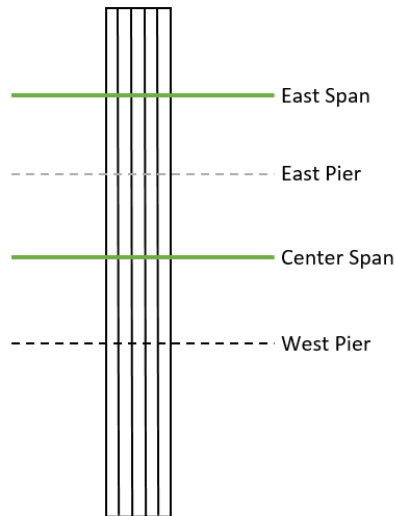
Maple Bridge instrumented braced dry run cross-sectional locations
